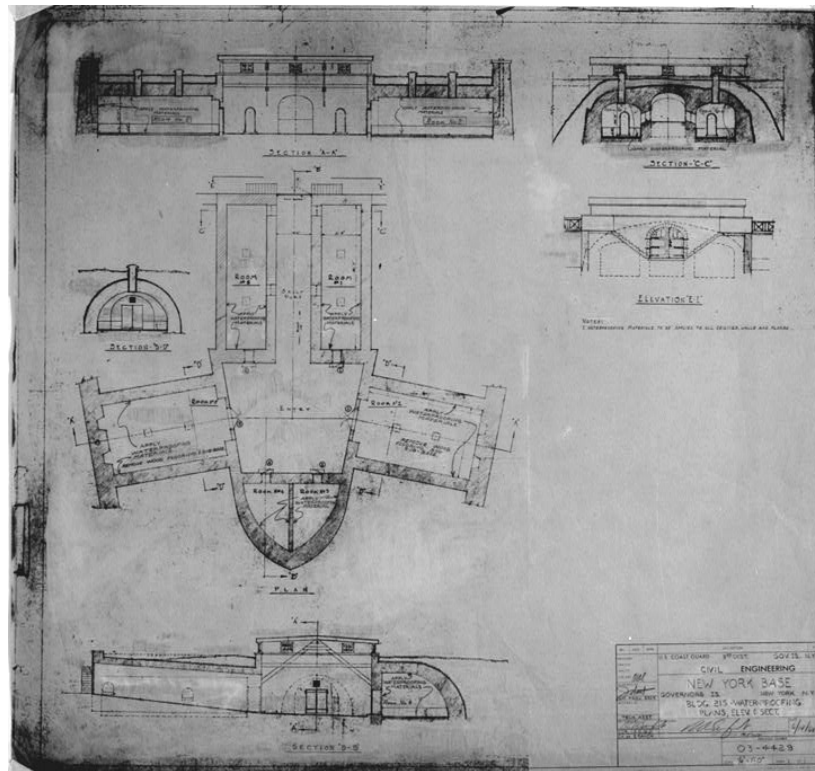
Plan, elevations, and section- elevation drawings of the magazine court in the north ravelin of Fort Jay, June 14, 1968.
